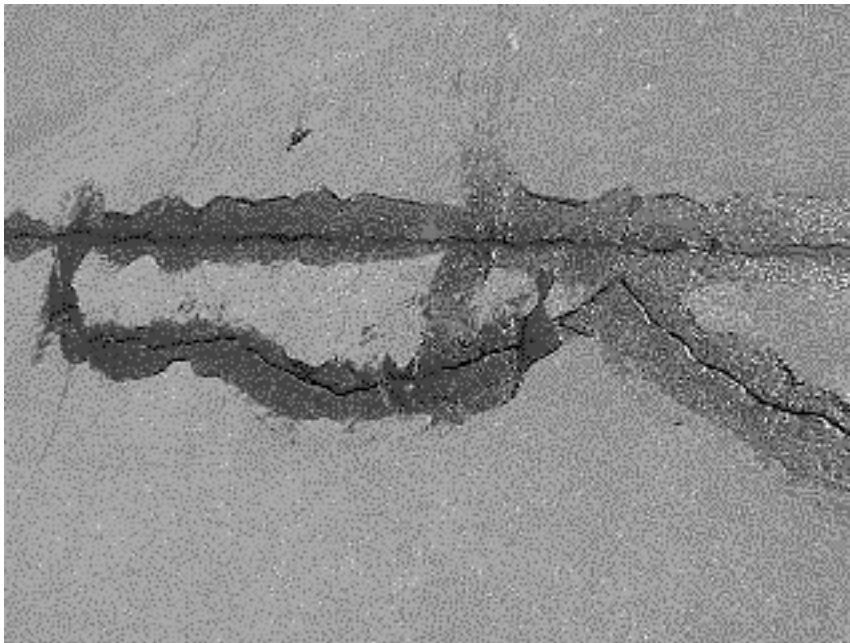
A Sealed Branched Crack at the UT-DOT Parking Lot
